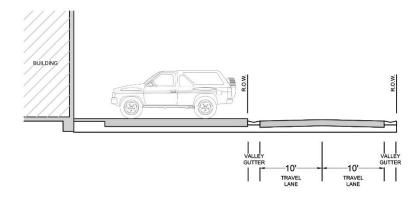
Secondary Street/Alley (Typical 24' Right of Way)
